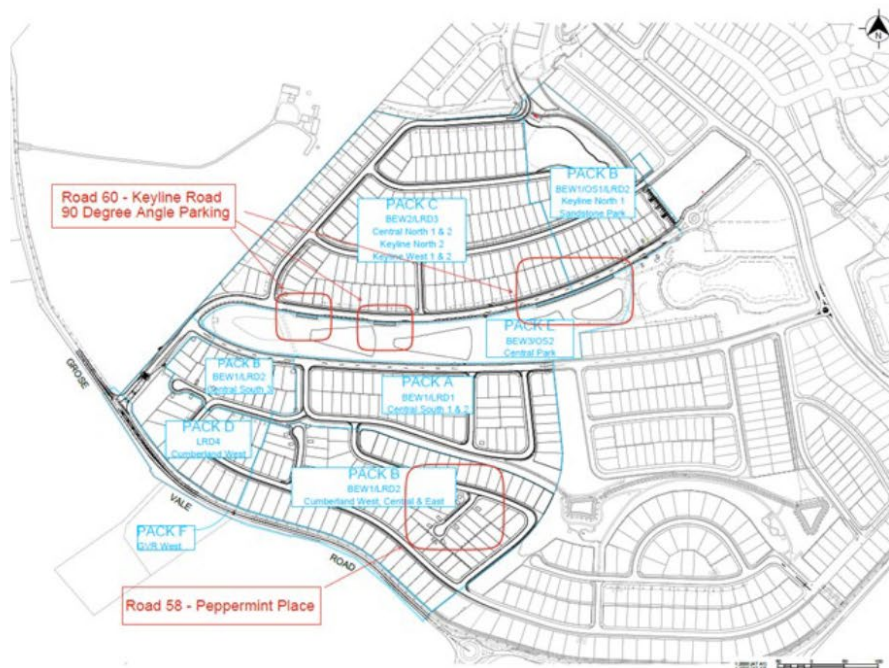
Site Extent and Proposed works on Road 58 and Road 60
